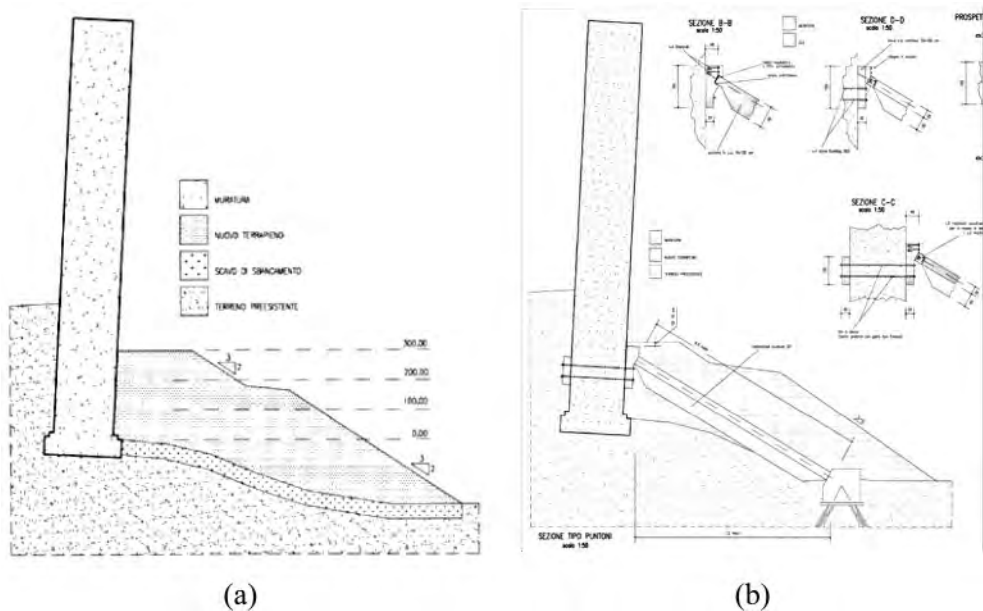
Interventions carried out in the N-E sections of the walls: new embankments (a) and supporting structures (b) (punched reinforced concrete plates).
